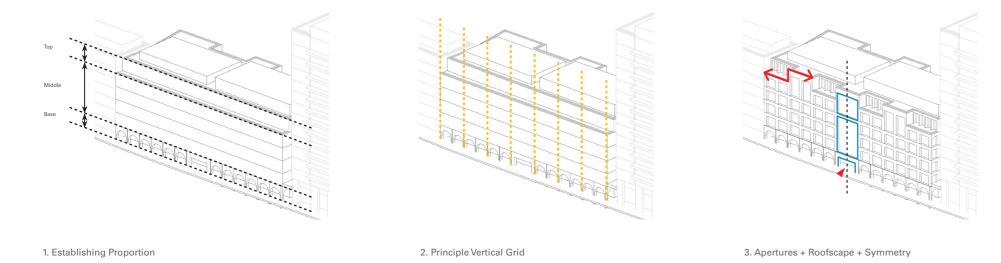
Illustrative facade rhythm and hierarchy diagrams to the Kensington Church Street building
